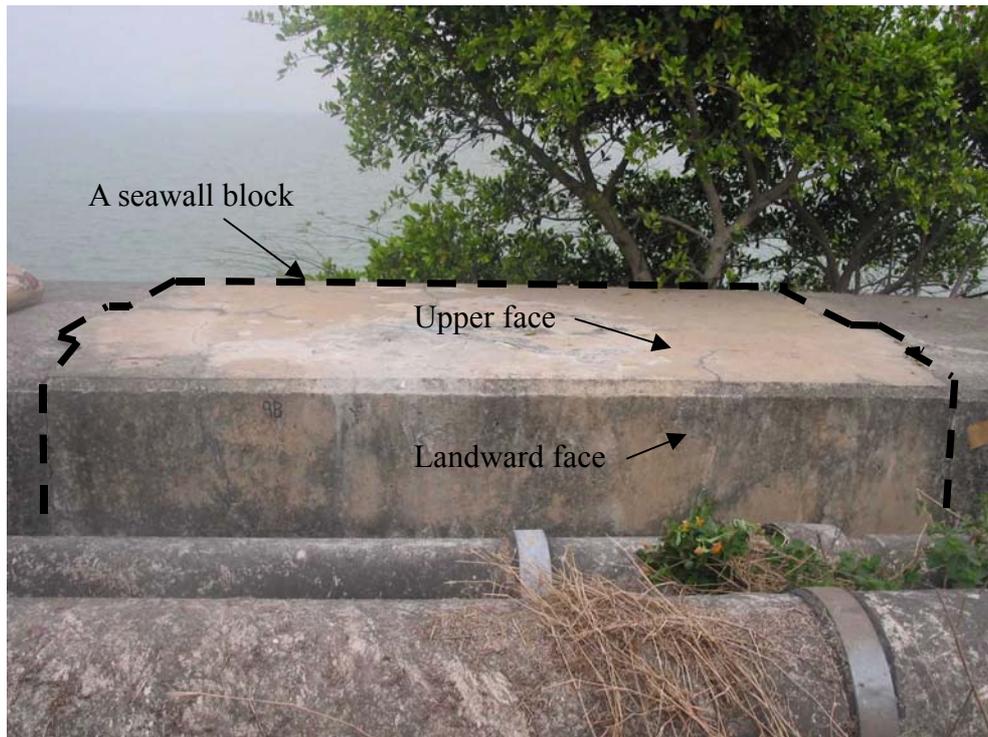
Upper Face and Landward Face of a Typical Seawall Block
